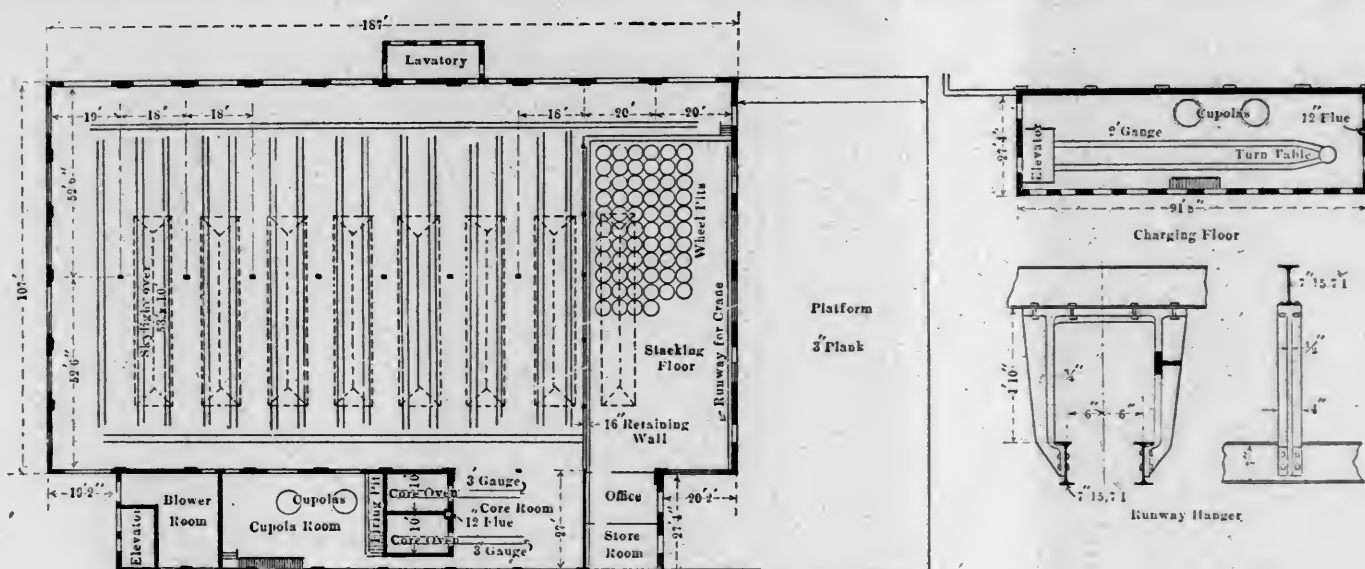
FLOOR PLAN OF WHEEL FOUNDRY.
